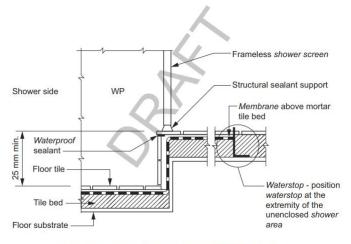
Typical unenclosed stepped-down shower construction (diagrams (c) and (d))
